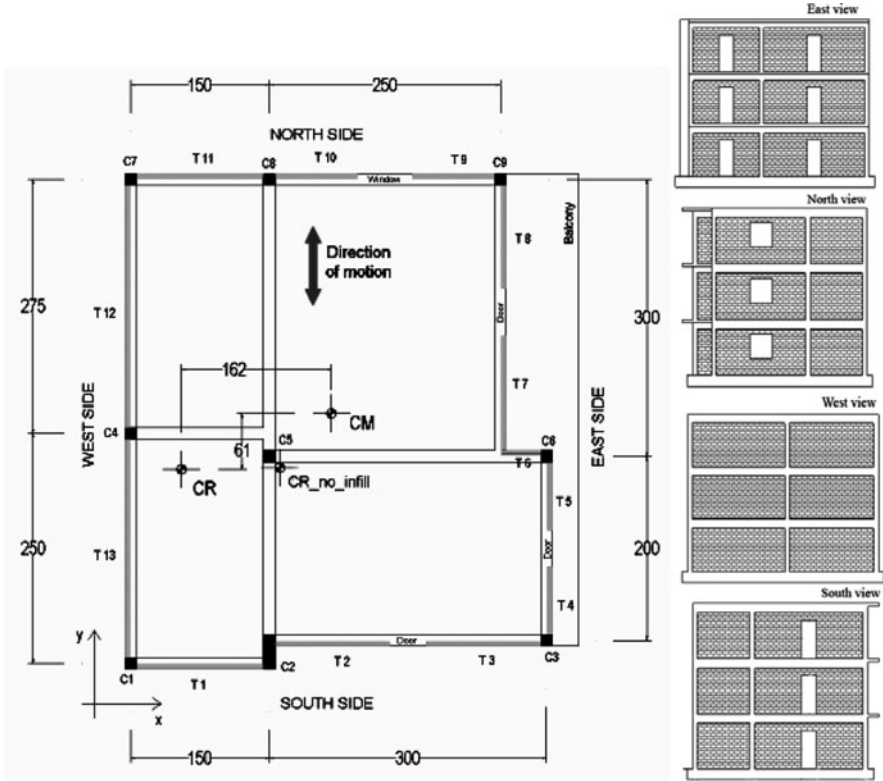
Framing plan of the building and four views in elevation (dimensions in cm)
